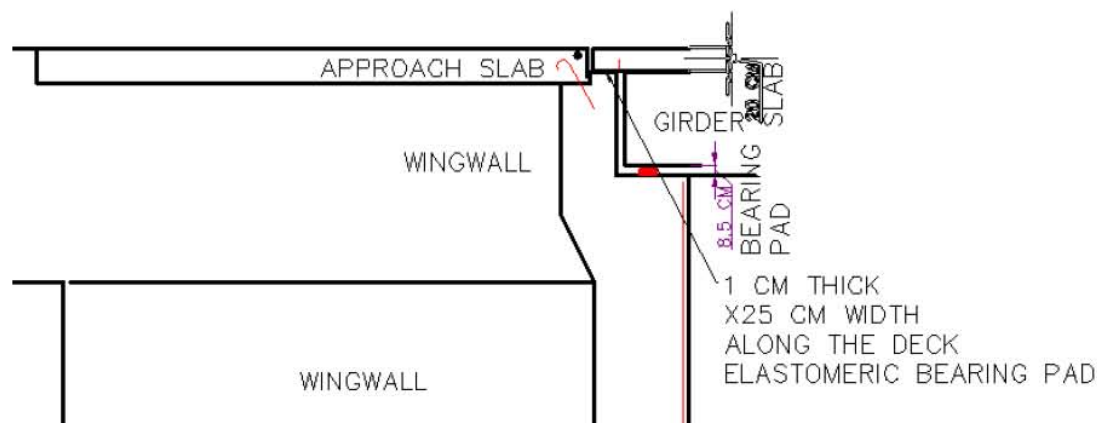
Free movement with hidden gap under slab to avoid expansion joint at abutments.
